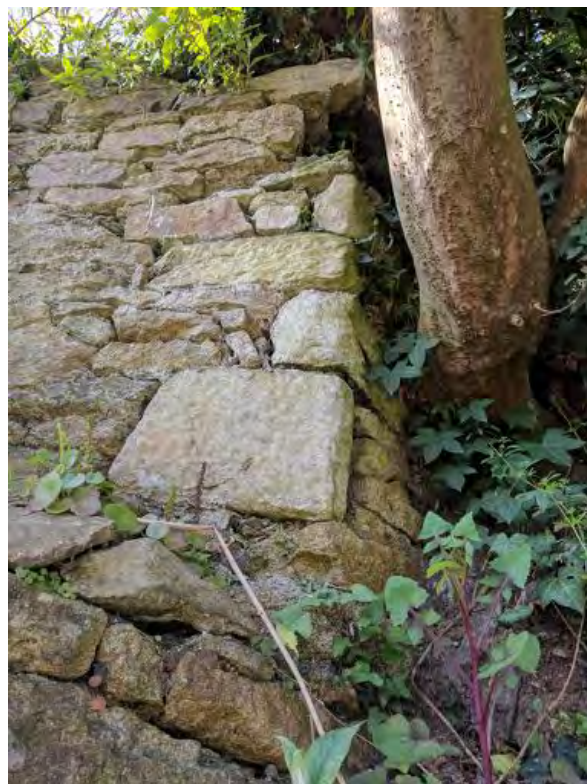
Detail of external arch wall intersection with earth bank with large tree growing from bank
